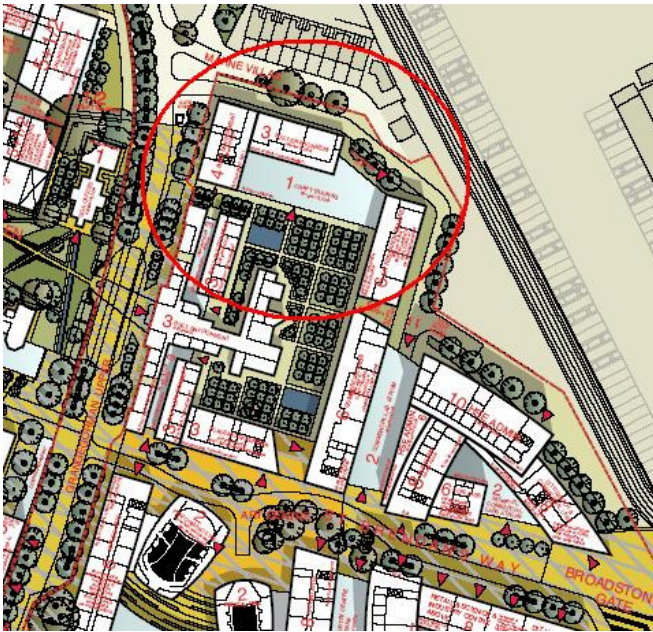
Proposed Central Waste Storage Areas Serving Academic ‘Hub’
